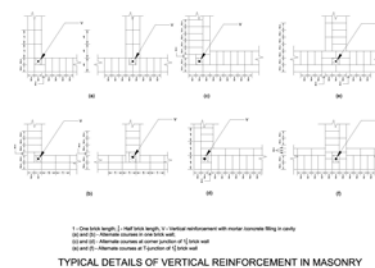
Seismic strengthening technologies: typical wall reinforcement details
